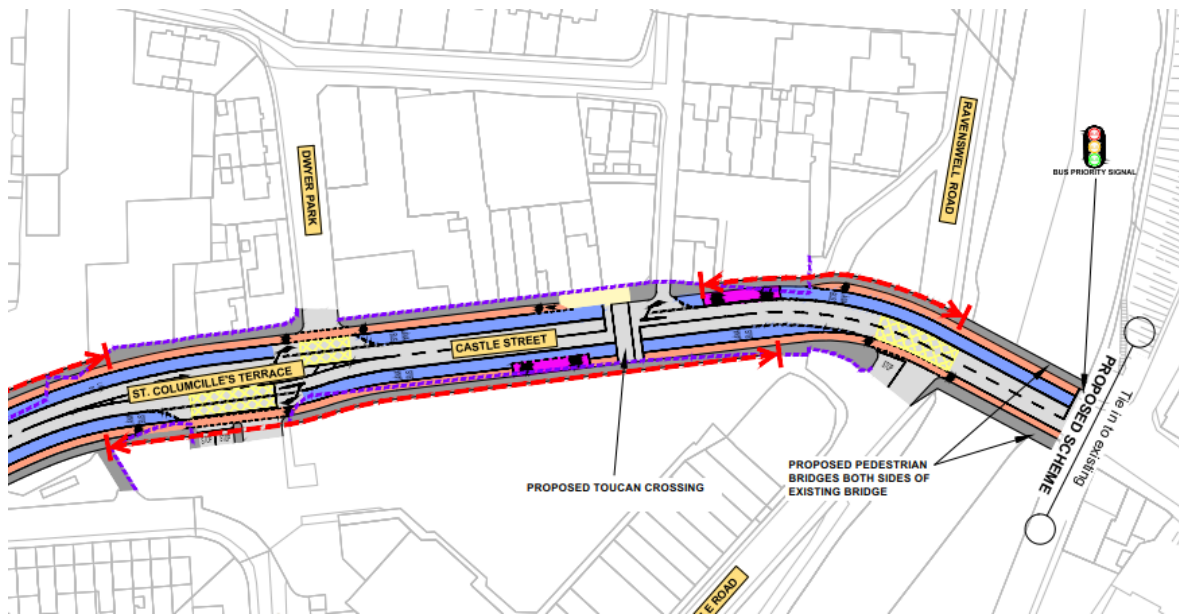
EPR Cross-Section along Castle Street, Bray
